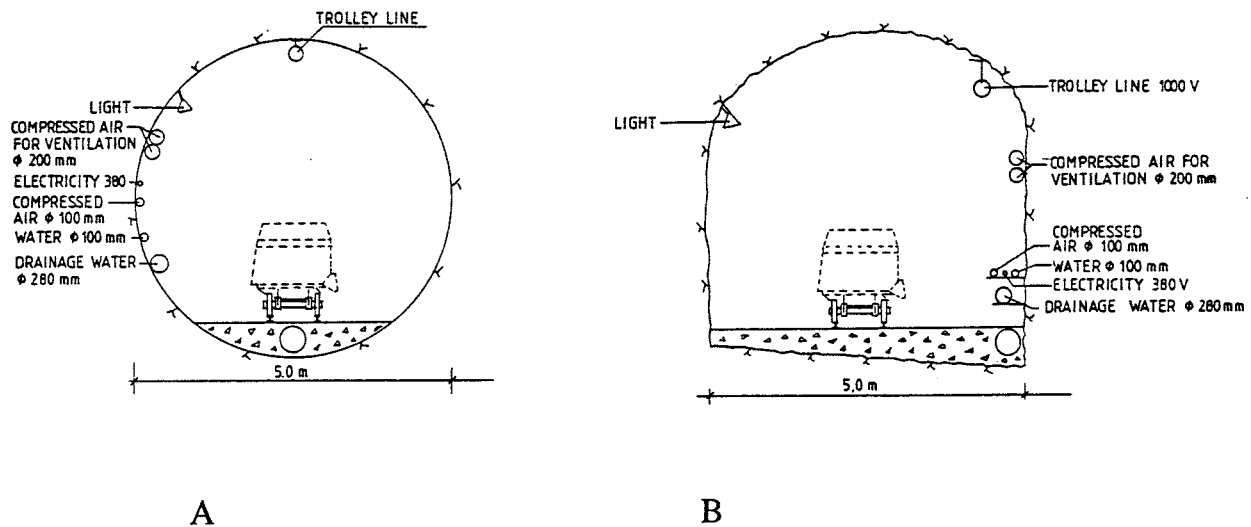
Ramp design for TBM boring, A, and for traditional tunneling with electrically driven equipment, B
